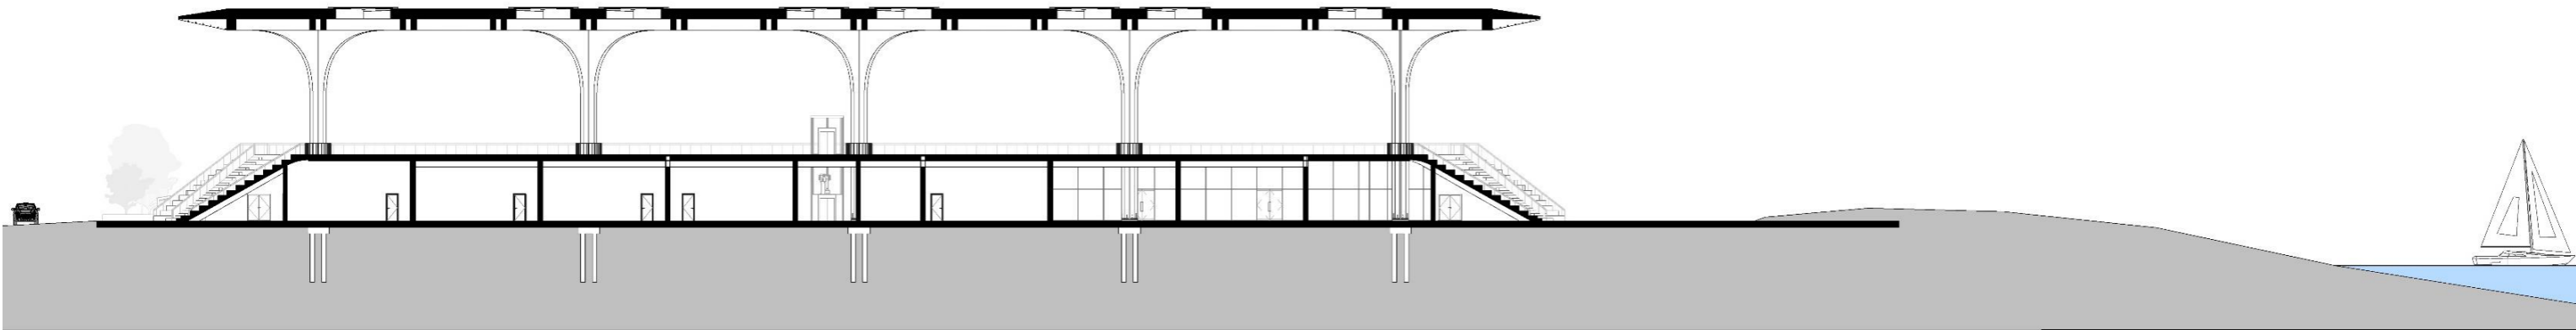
Section A Scale 1:500 @A3 (See Appendix B Level 1)
